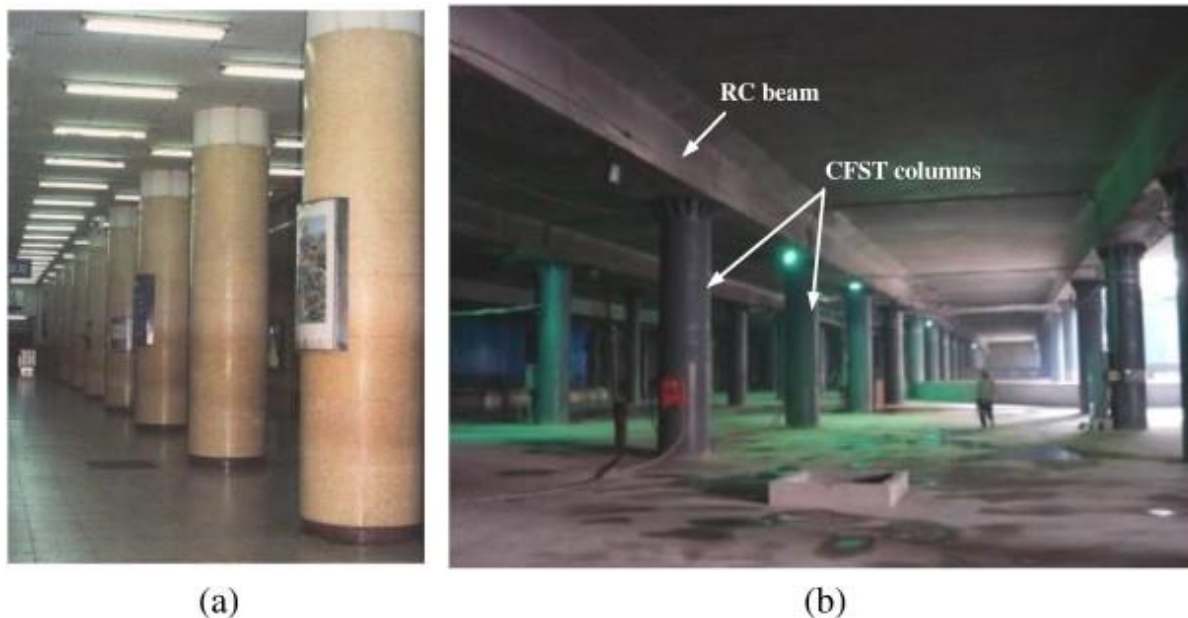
Subway stations using CFT columns [Han et al. 2014b]
